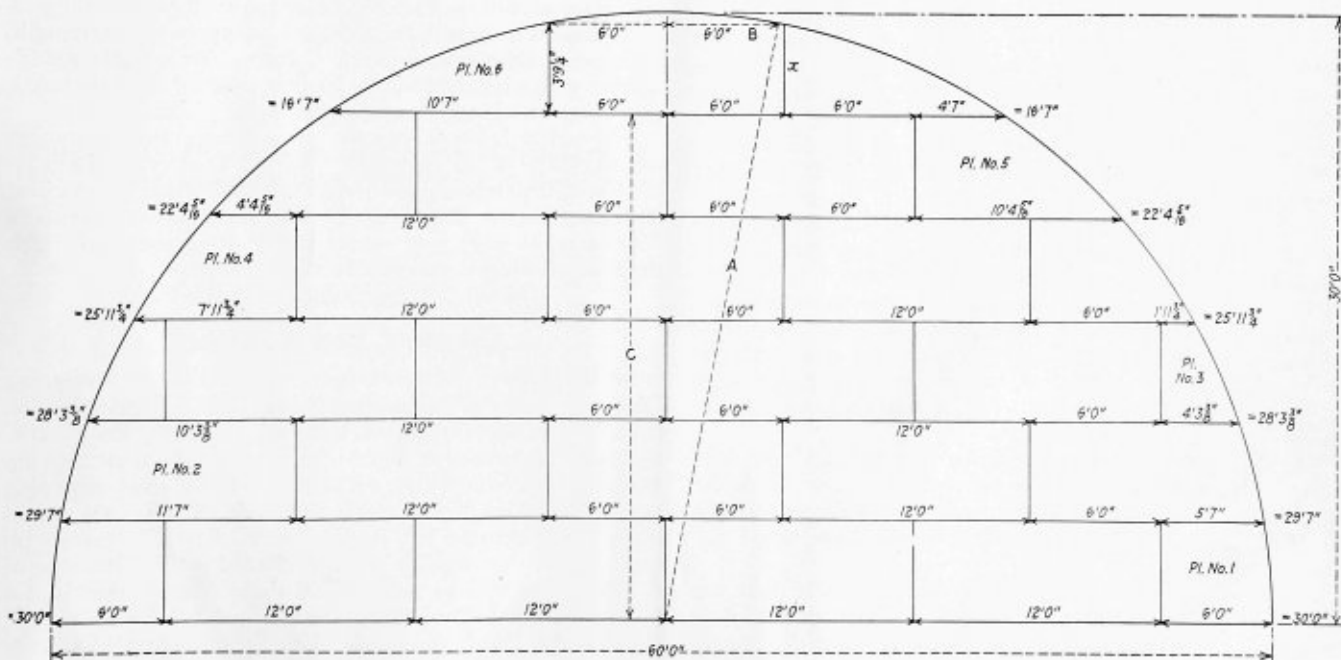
Plate Layout and Dimensions for Tank Bottom
